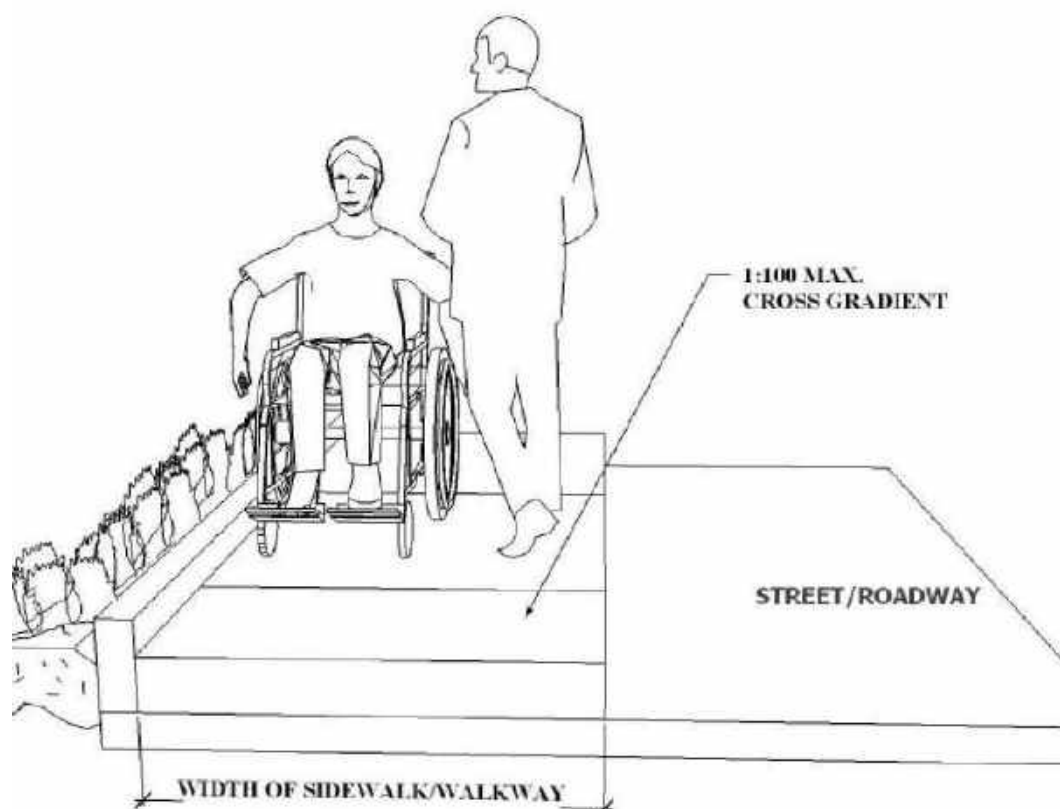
Image above shows 1.20m Minimum Sidewalk Width for 2-Way Traffic and 1:100 Maximum Cross Gradient
